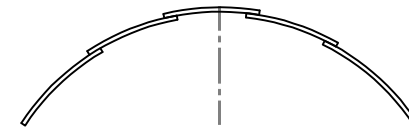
PLATE LAPPING DETAIL (LOOKING DOWNSTREAM)
